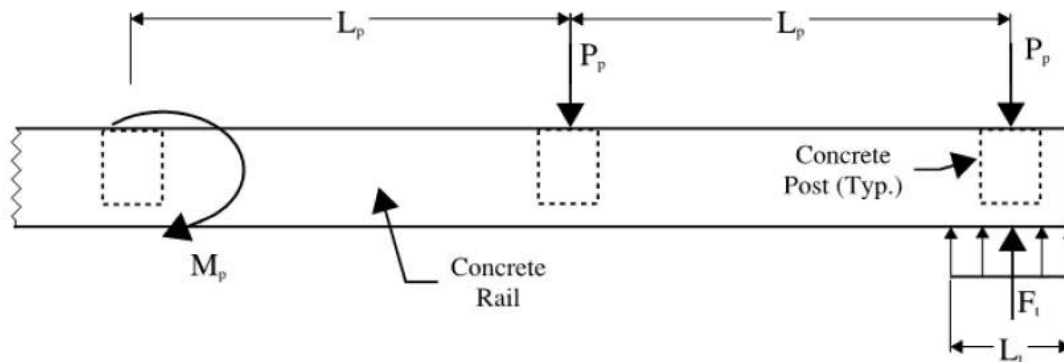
Two-Span Failure Mode for Post-and-Beam Railings at an End Section or Joint
